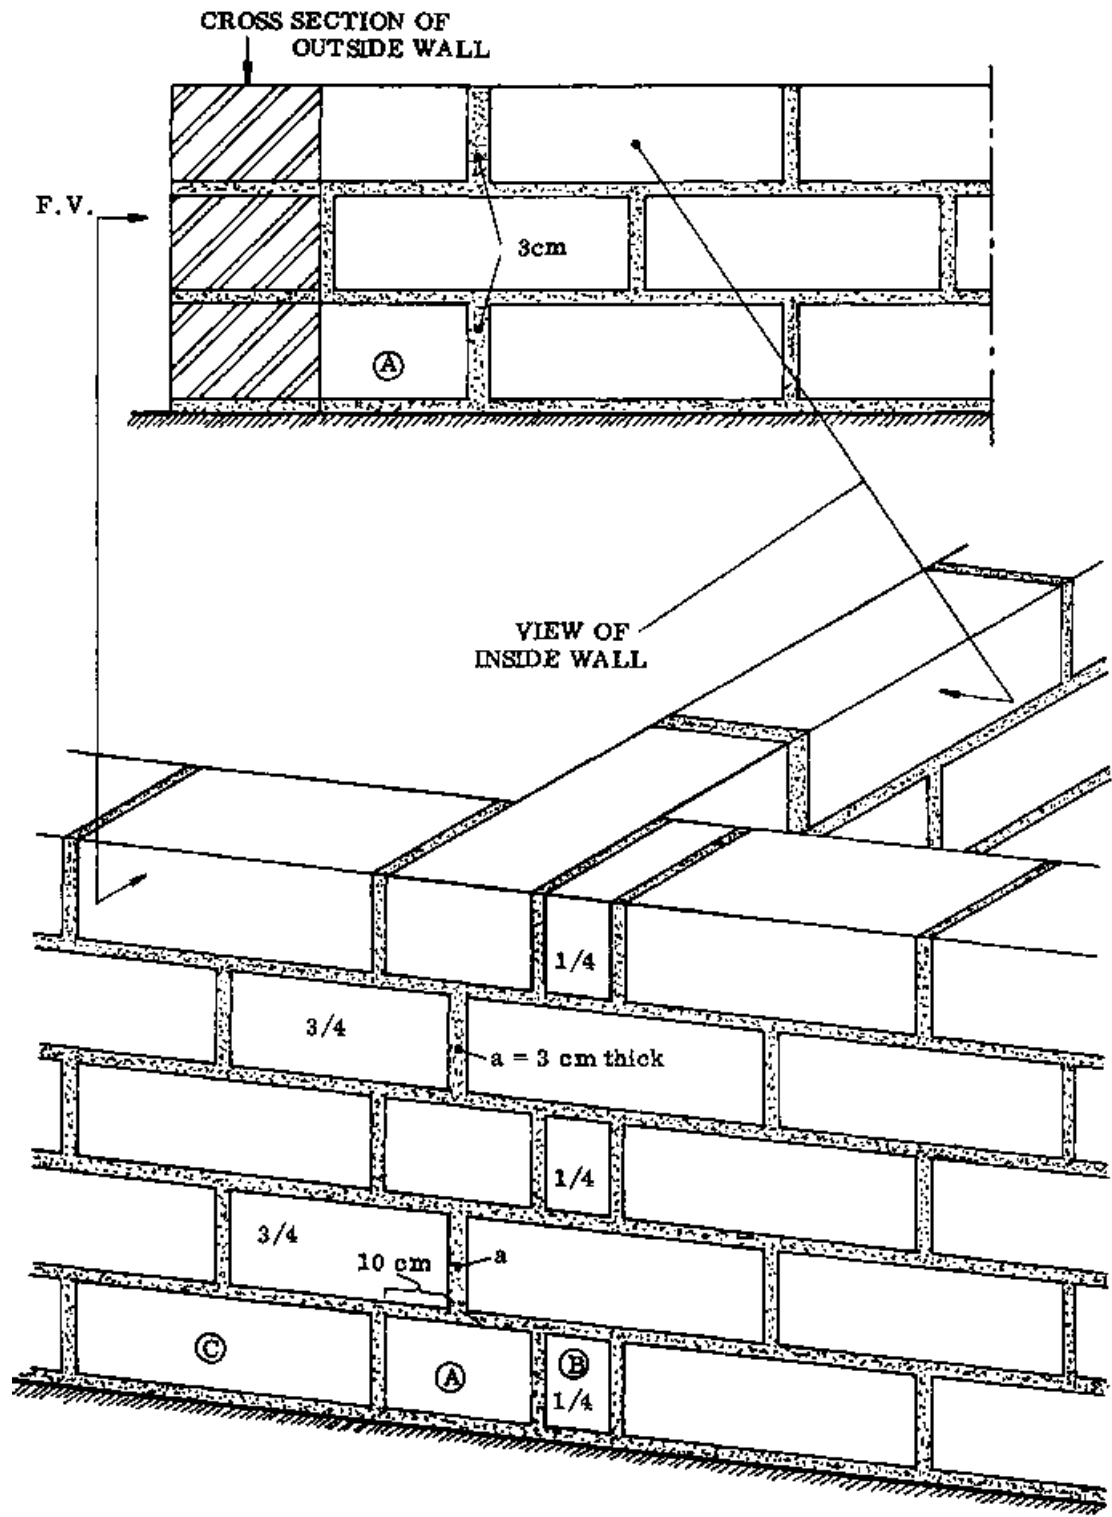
& 2 COMBINED SECTION OF OUTSIDE WALL AND VIEW OF INSIDE WALL
